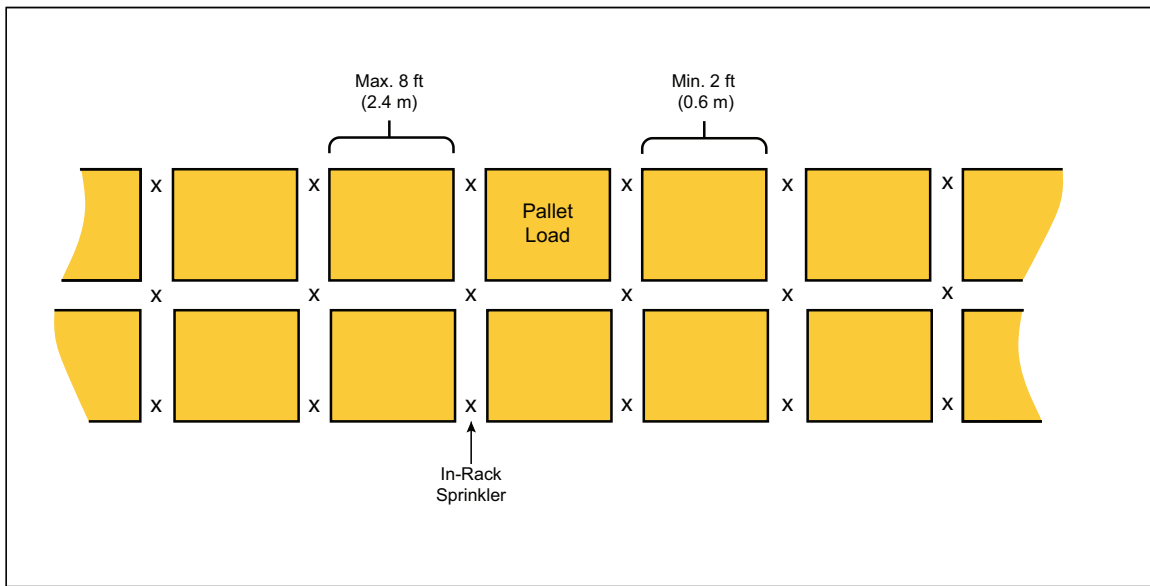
Plan view of IRAS(E) horizontal in-rack sprinkler arrangement for double-row racks (face and flue)
